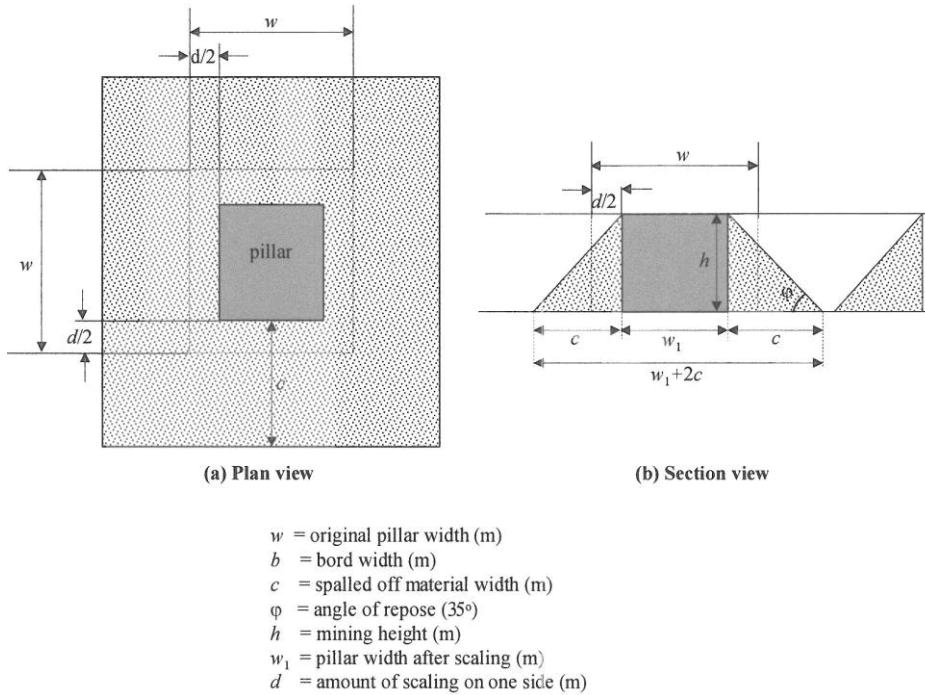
Plan and section of a spalled pillar (aprons not touching).
